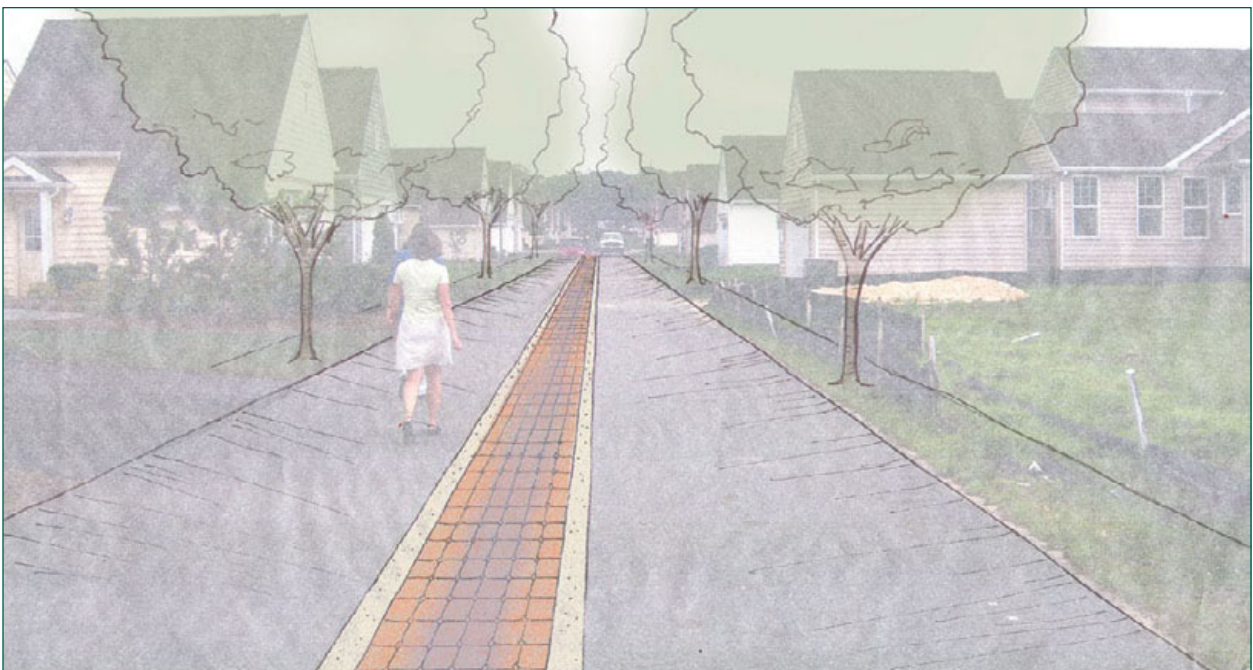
Retrofit potential: Center strip of pervious paving in a residential alley.
